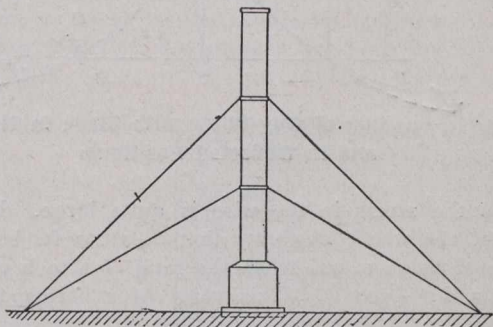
Typical Arrangement of Guy Wires for Stack.
